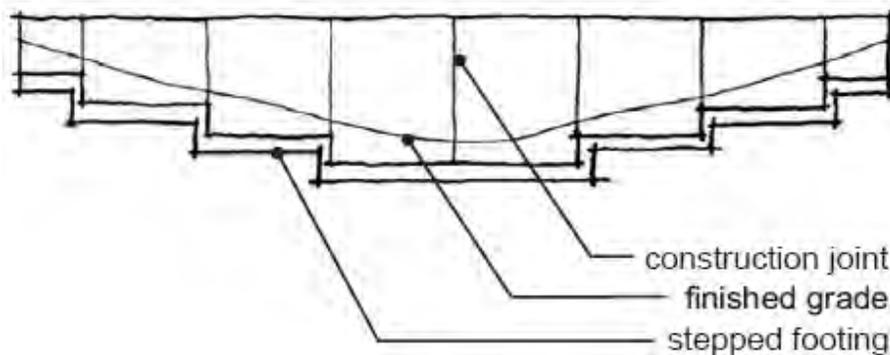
Terrain-contoured wall in cut section (Elevation View)
